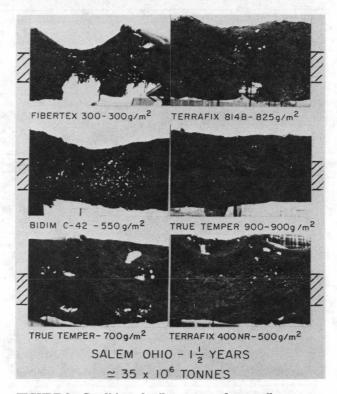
Condition of rail seat area of geotextiles exhumed after 18 months from Conrail's Salem site.
